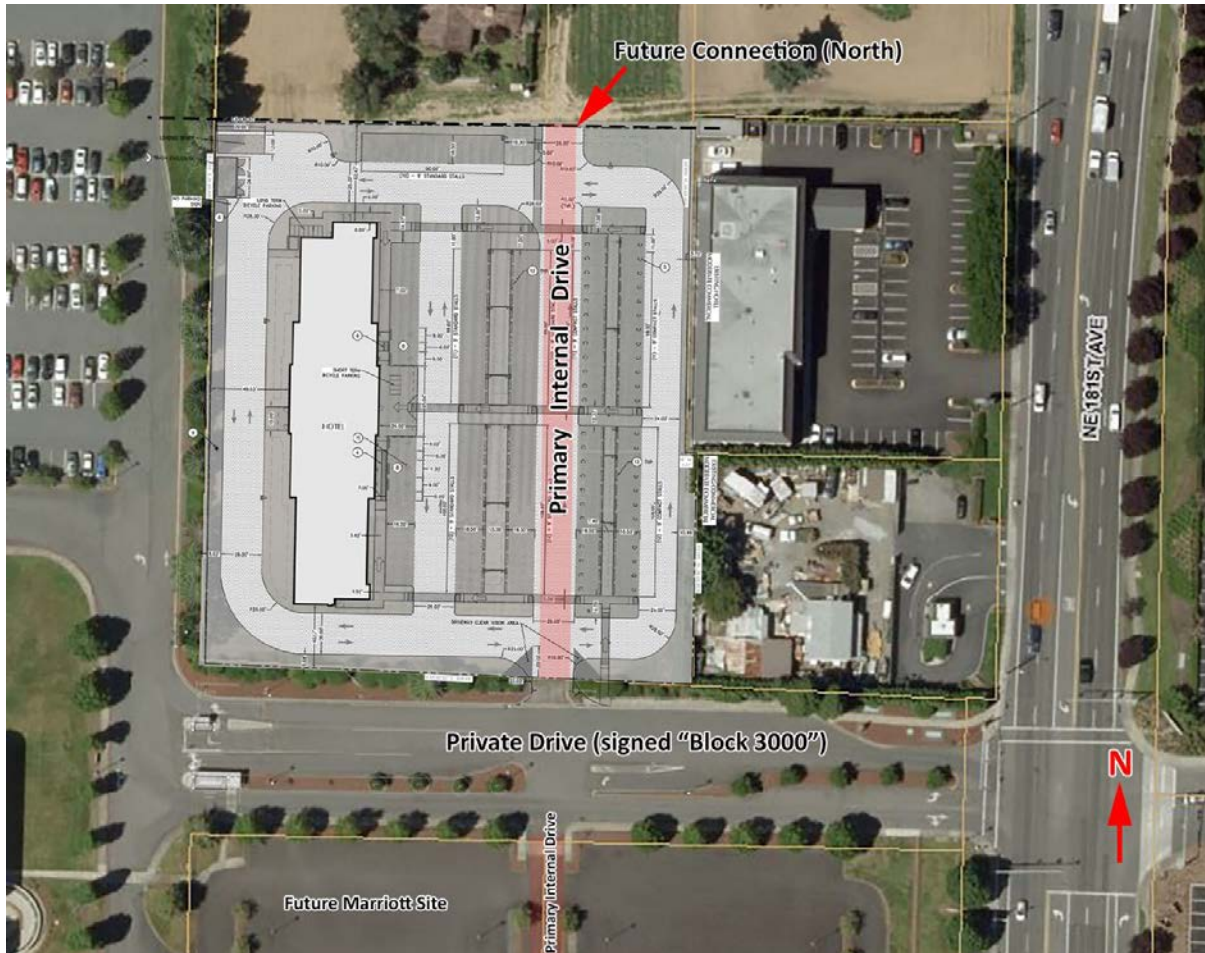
Proposed Primary Internal Drive (oriented north-south) and the existing Private Drive (oriented east-west) with a future connection to development to the north.
